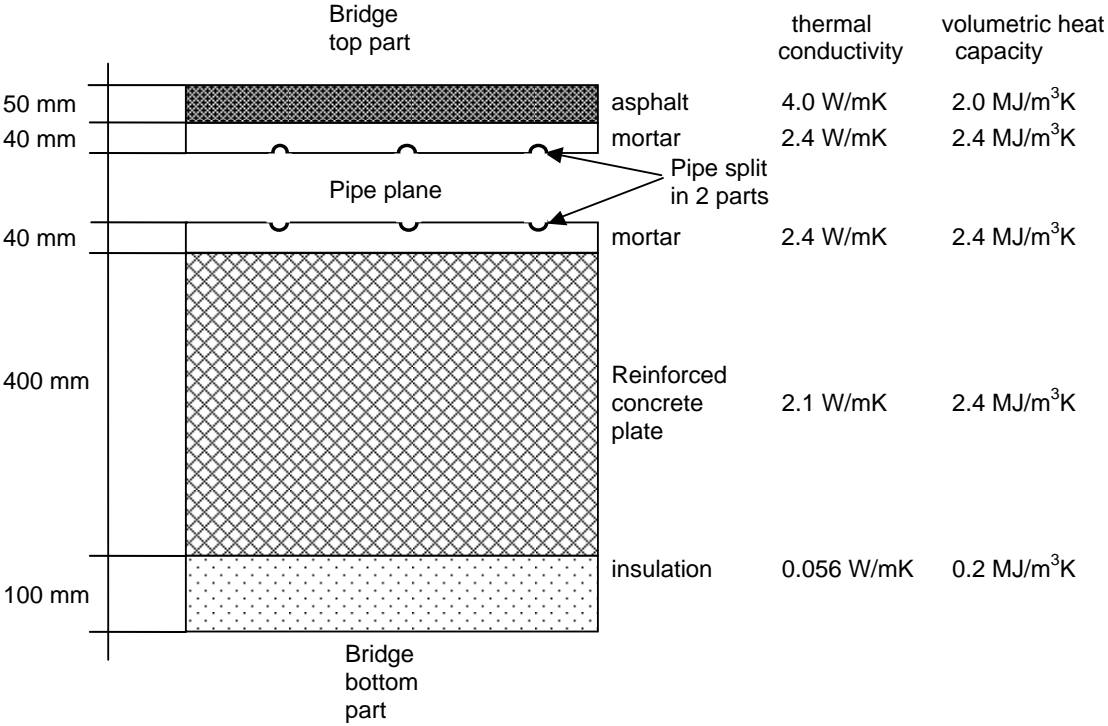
Section of the bridge in Serso subdivided into two parts: above and below the pipe plane
